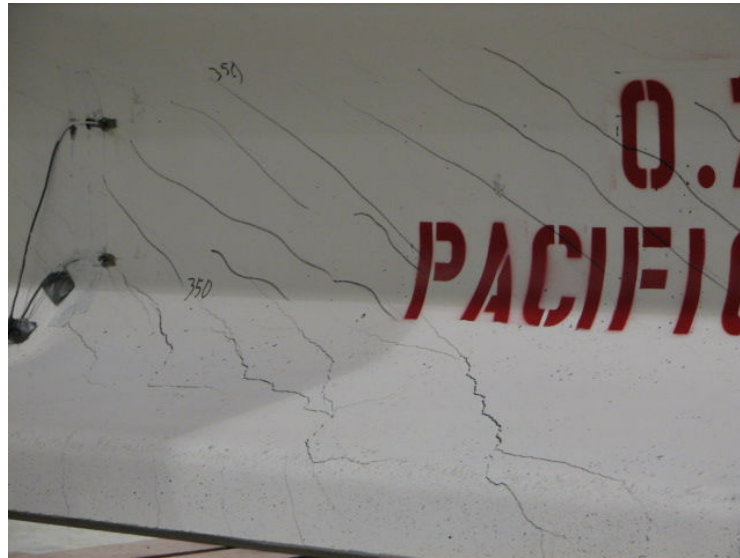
Shear cracks propagating through flange
